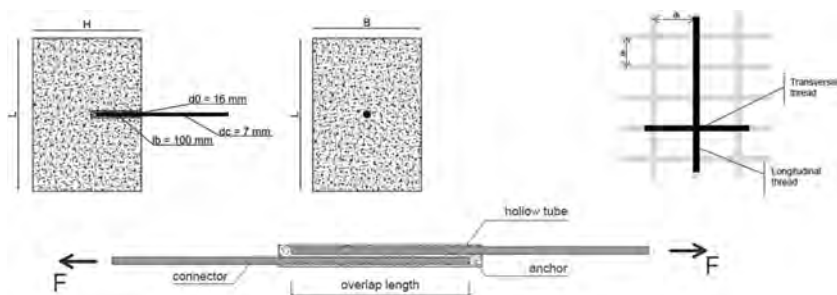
Pull-out connectors specimens – joint shear test specimens - lap splice specimens.
